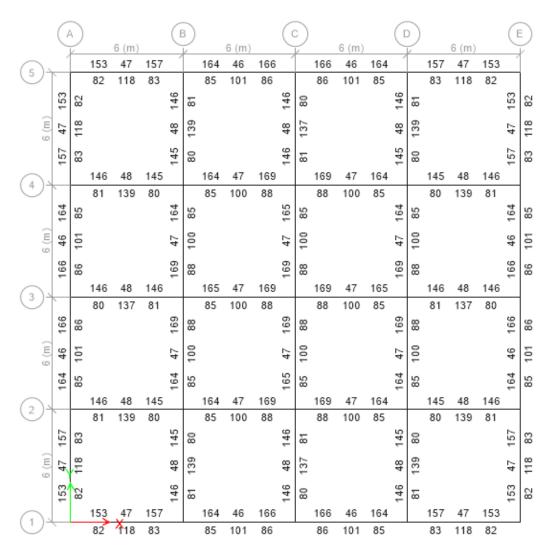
Beams reinforcements (mm<sup>2</sup>) for story 1
